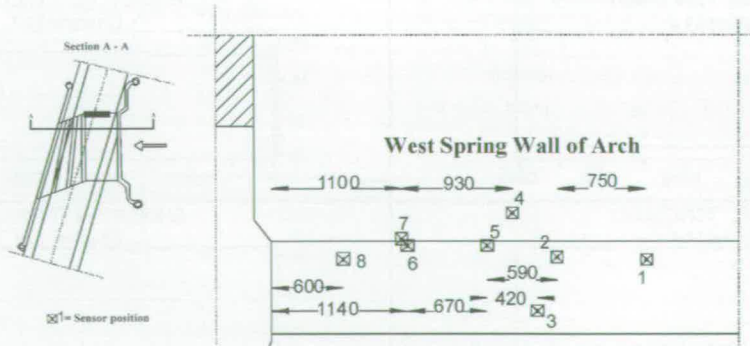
Side elevation of sensors positions along the west spring wall of the arch.
